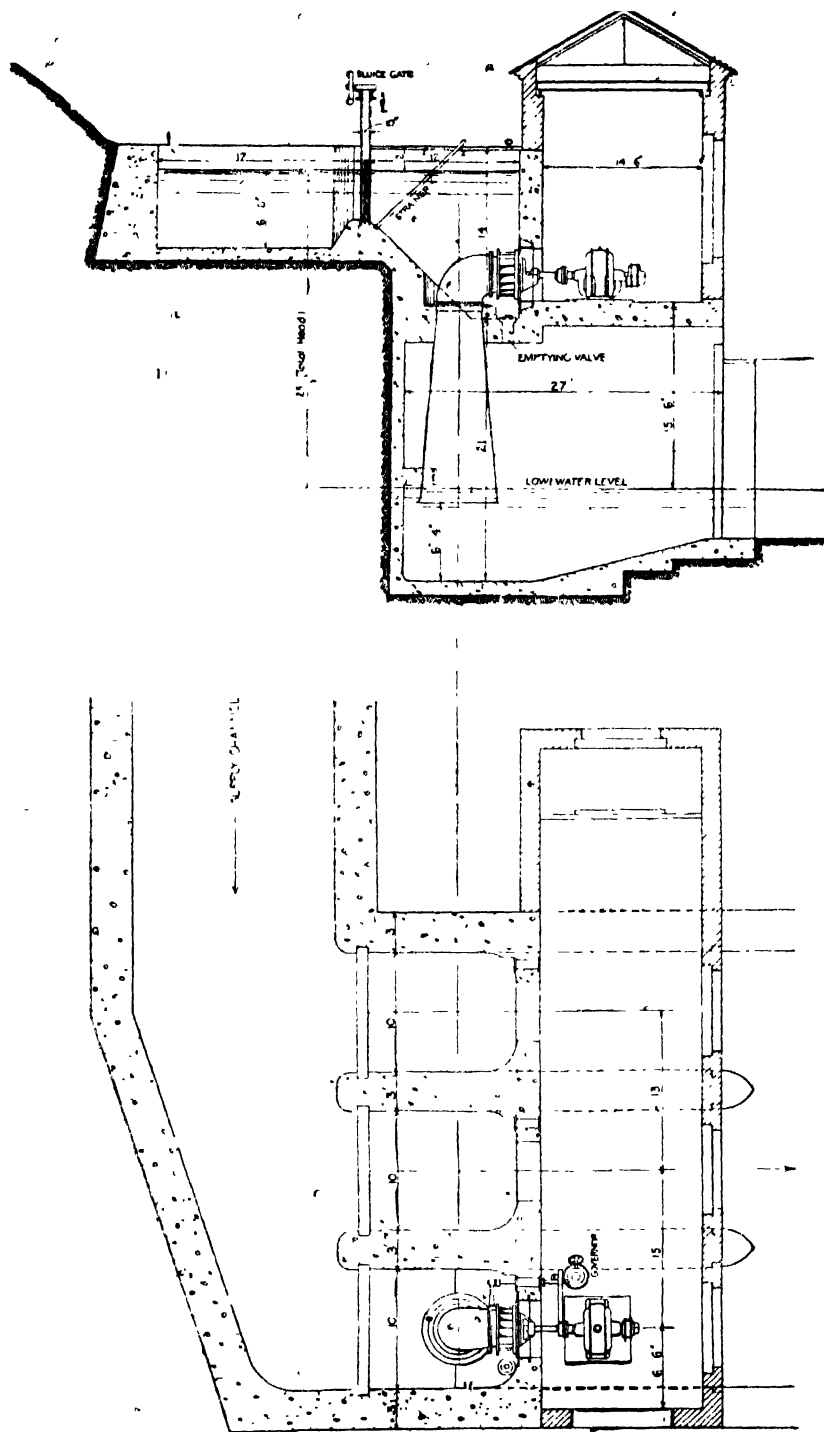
Single-wheel, Direct-coupled, Horizontal Shaft Units
